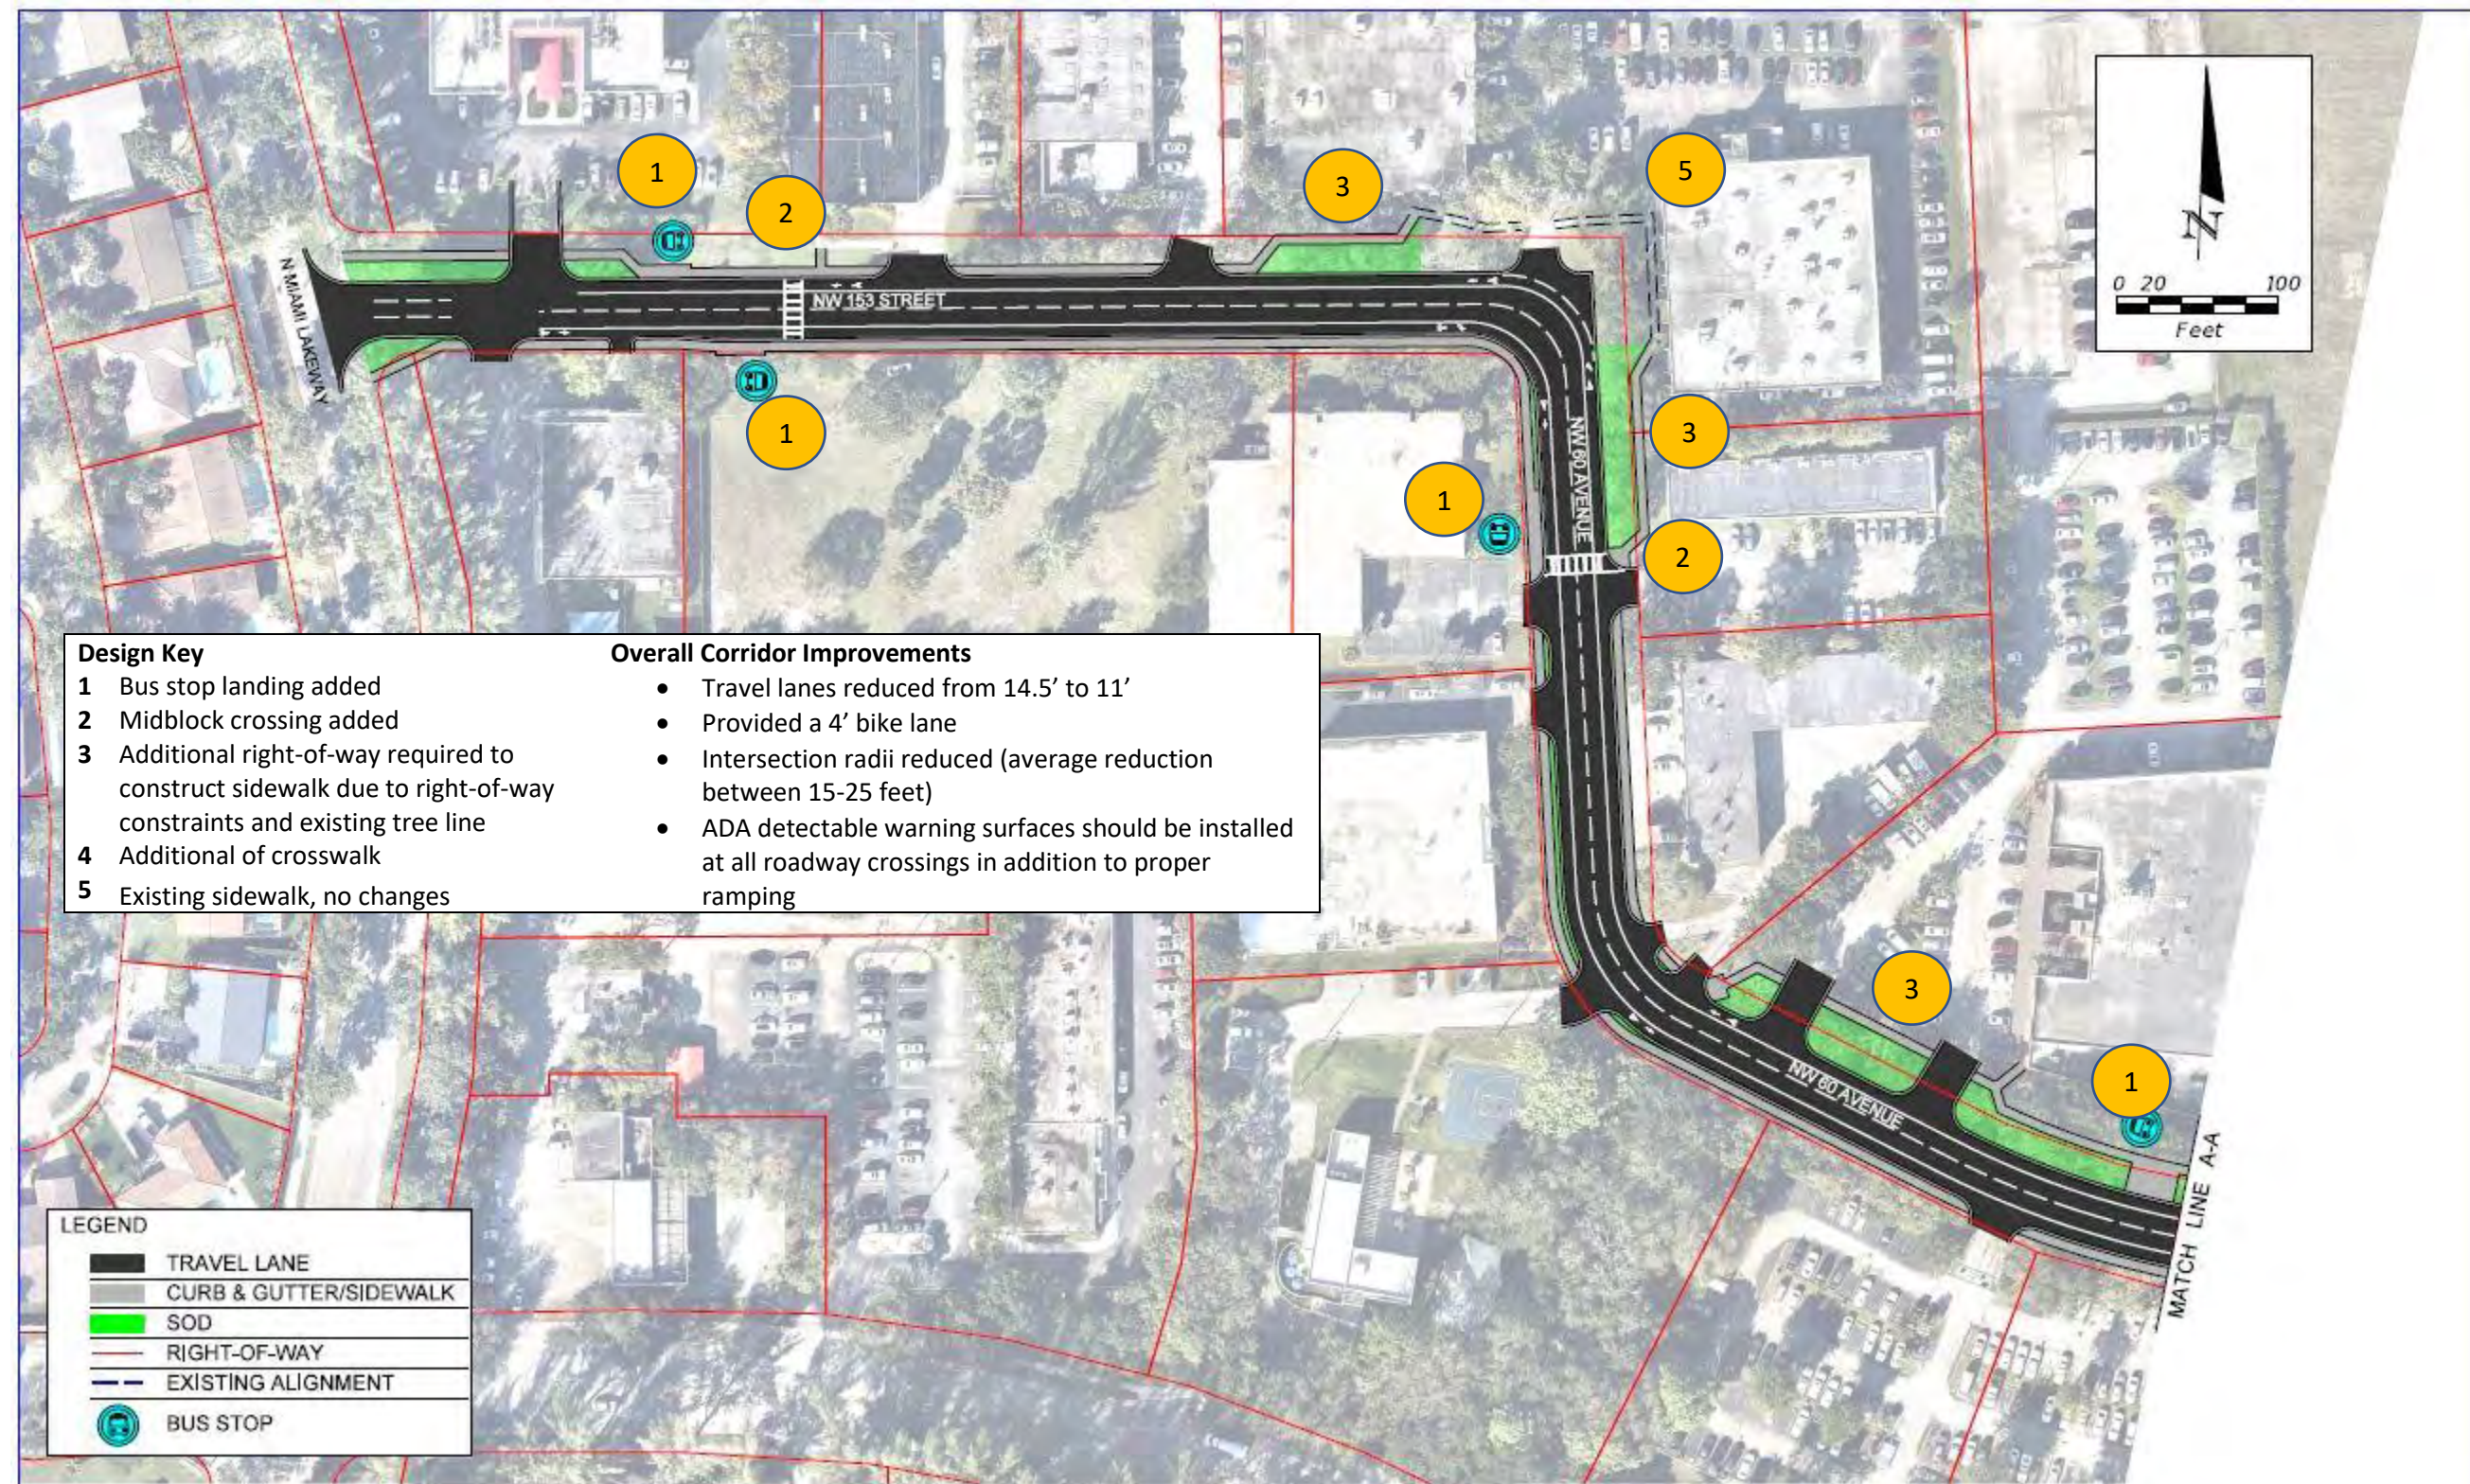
Civic Street - NW 151/NW 153 Street Proposed Concept (A-2)
